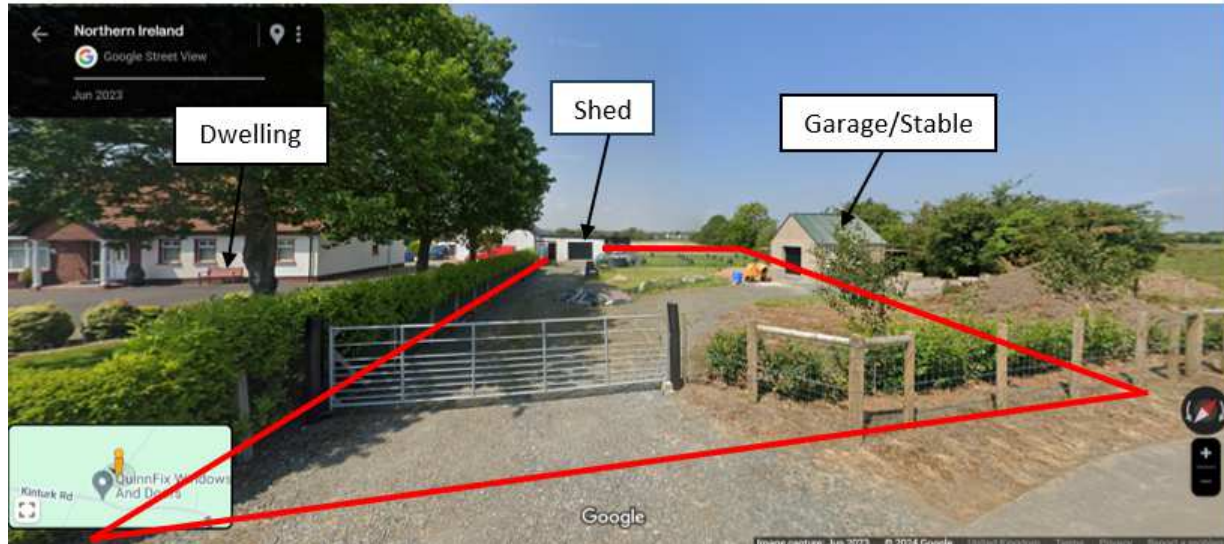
Site containing shed identified red between dwelling and ancillary general-purpose garage/stable.
